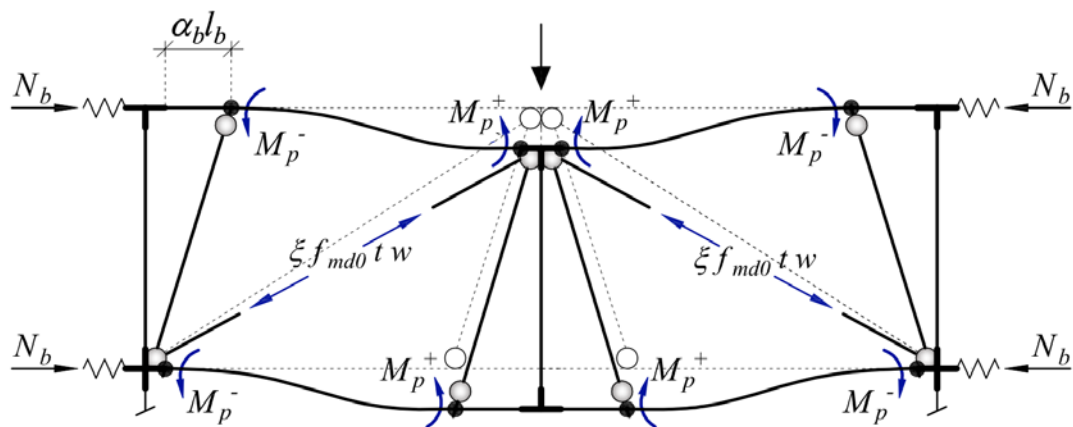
Typical collapse mechanism of the proposed equivalent strut model (sample for a one-storey infilled frame).
